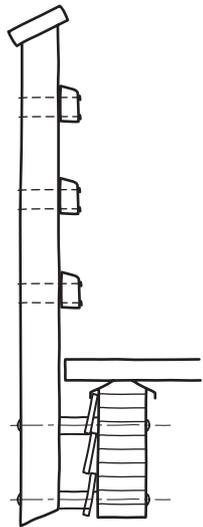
Cross-section of a beam and the parapet of a pedestrian bridge. The top surface of the beam is sloped and protected with a corrosion-resistant sheet metal. The outer face of the beam is protected with replaceable cover boards. The contact surface for the deck is as small as possible and well ventilated. The handrail is sloped and includes drip mouldings on the underside. The parapet rails are lifted off the post by means of galvanised round washers. The upper edges of the rails are sloped after Nordic Timber Council (Ref: 26)
